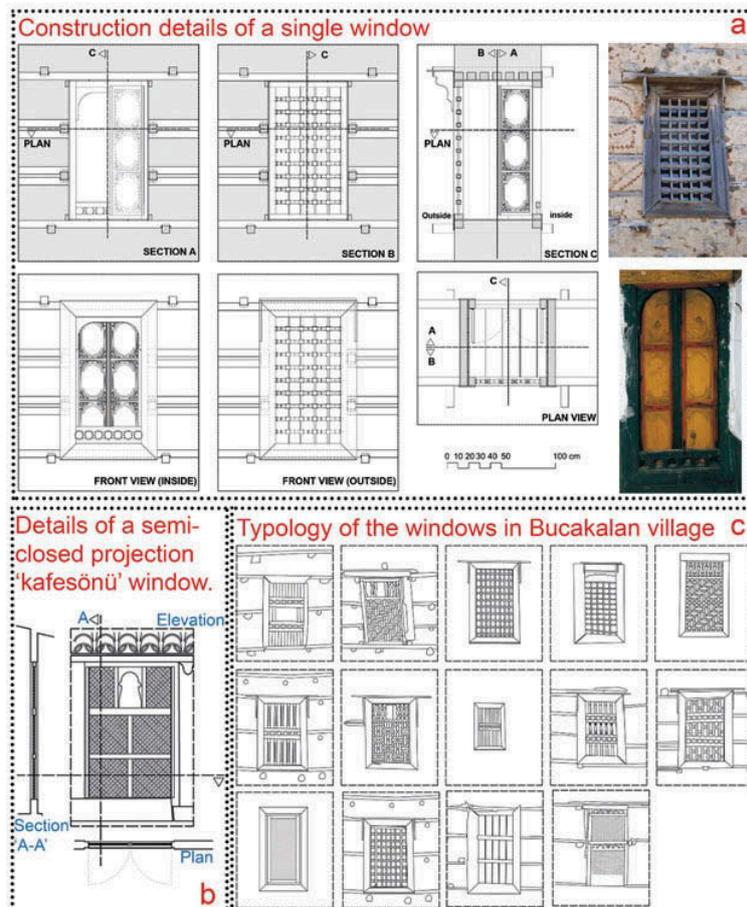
Construction details of a single window: (a) details of a semi-closed projection (“kafesönü”) window (b), and typology of the windows (c) in the Bucakalan village.
